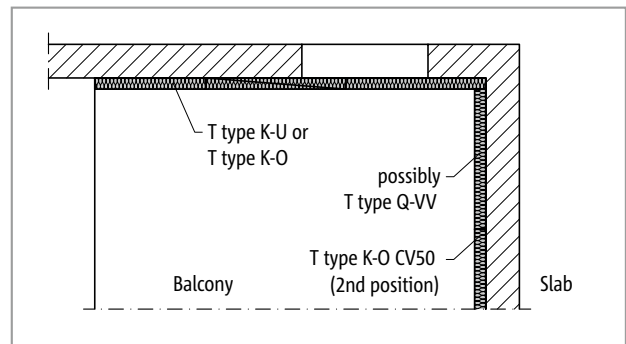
Schöck Isokorb® T type K-U/K-O, T type Q-VV: Balcony with inside corner, double-faced supported
